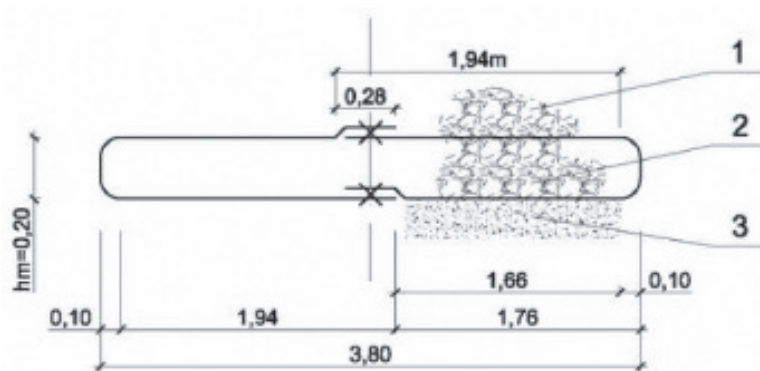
Vertical cross-section through the reinforcing mattress [18]: 1 - ballast bedding, 2 - crushed stone filling the mattress space, 3 - protective layer made of waste material.
